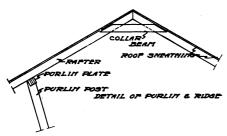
Details of typical ridge and purlin. in 8 feet, and twice
